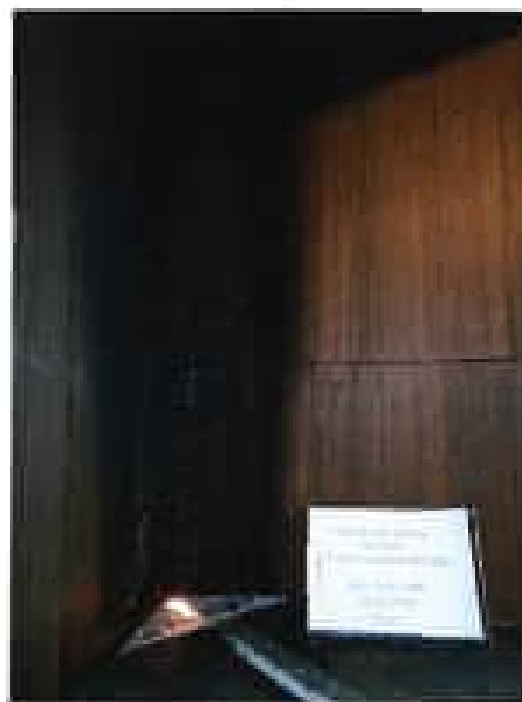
and 2 : Specimen with horizontal orientated planks prior to testing
